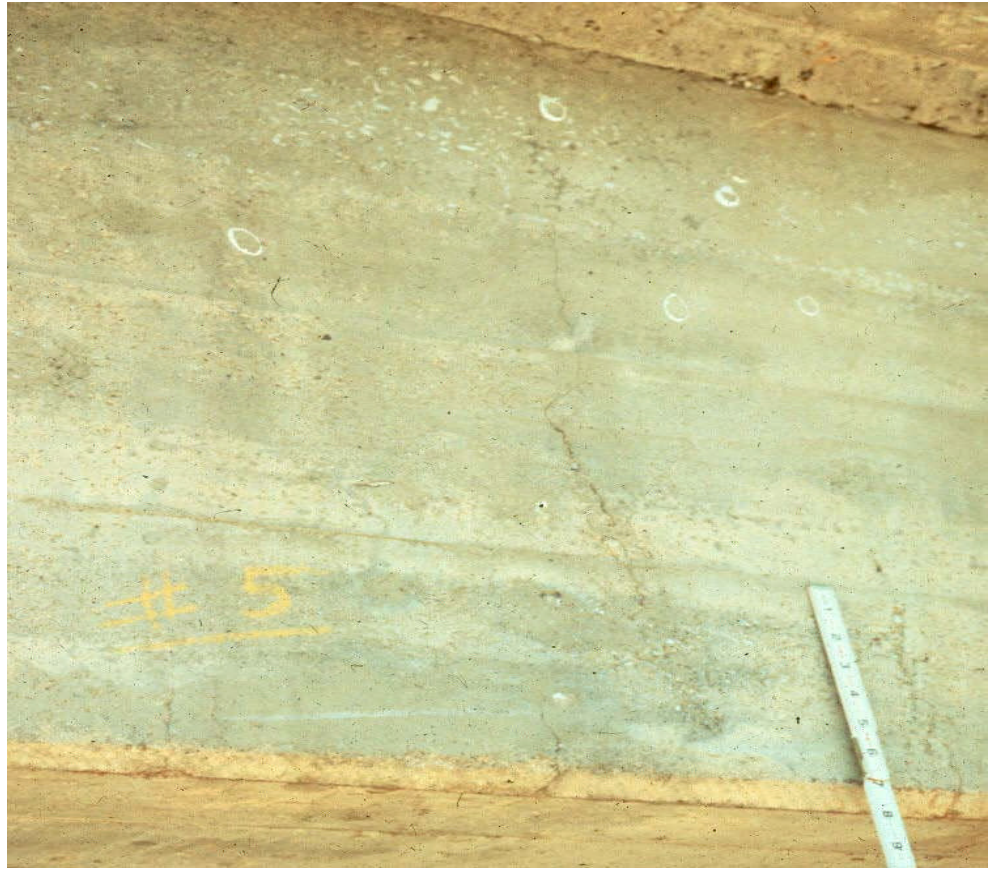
Flexural Crack on a Tee Beam
